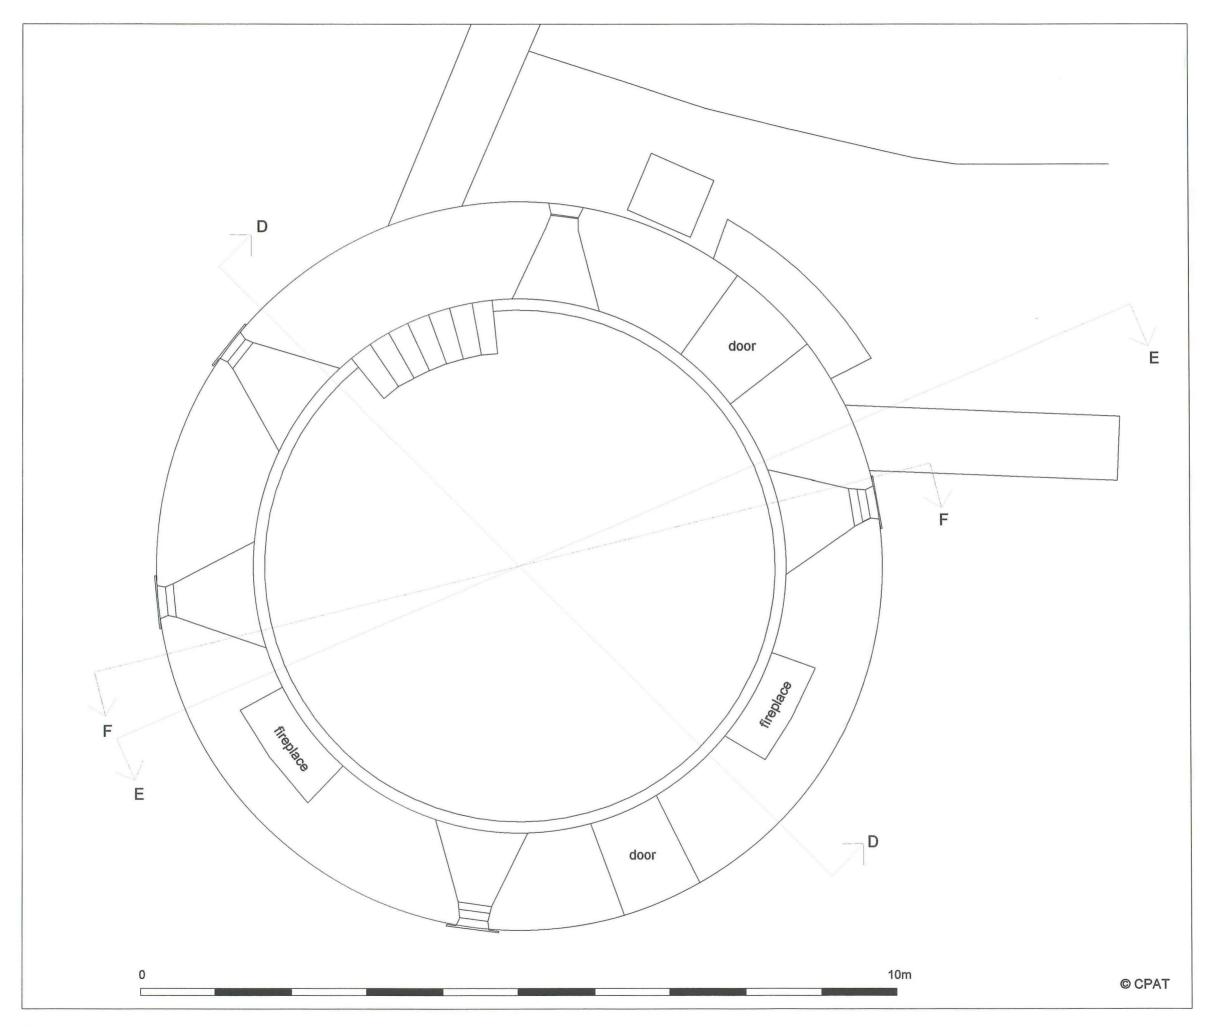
Roundhouse Farm south-west tower, ground floor plan
